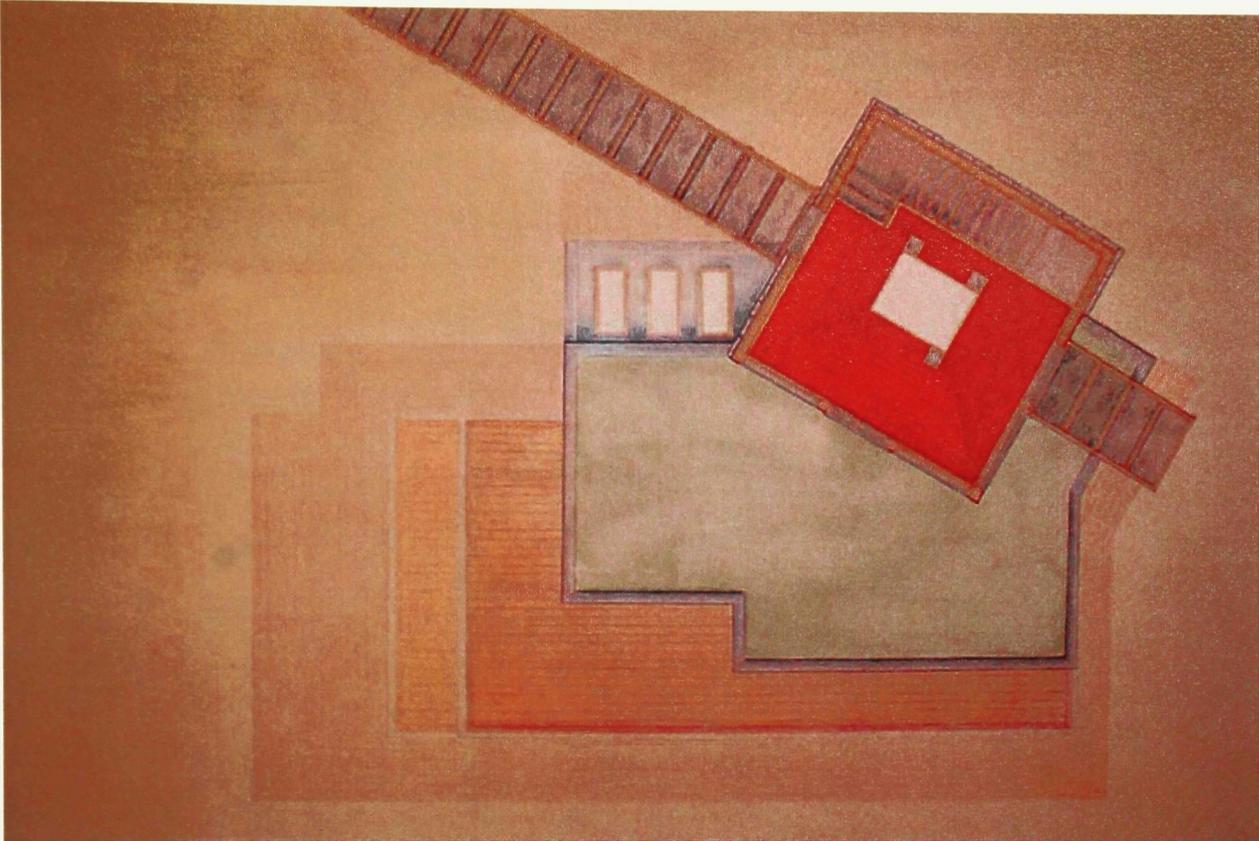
Plan: Tower Room Entry Level of Year Round Tree House Home
